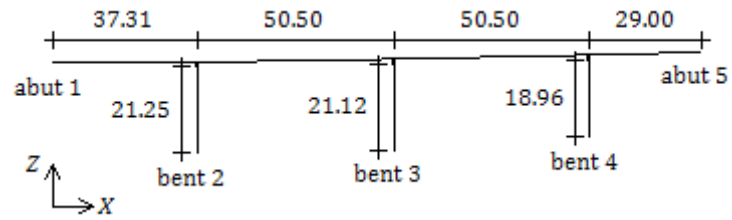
Penstock Bridge: Elevation (Dimensions are in meters).
